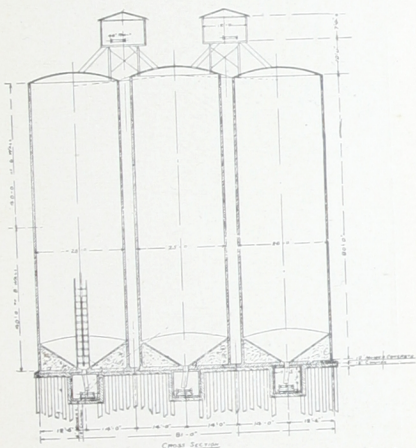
Cross Section of Grain Storage Plant built on Monier System.
